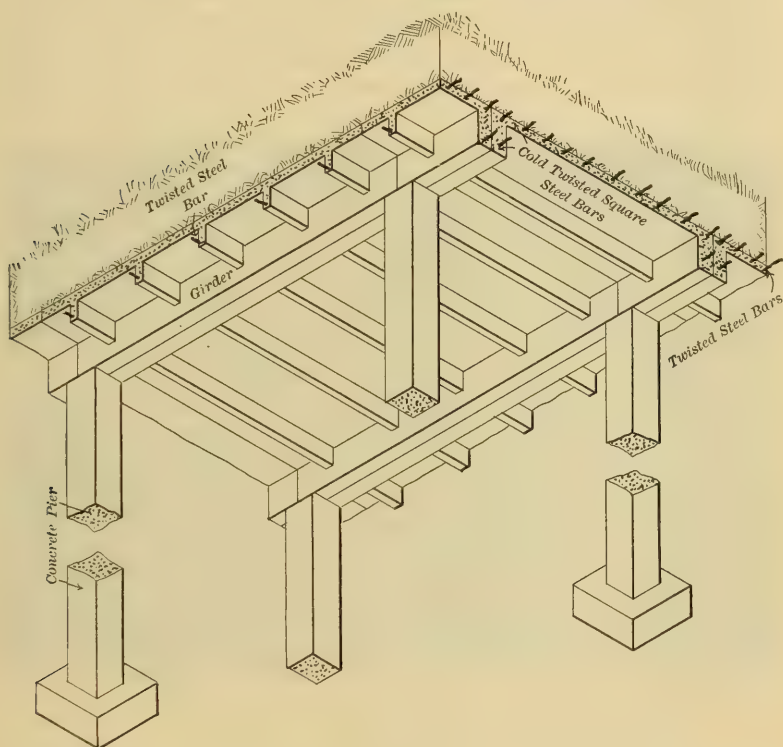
DESIGN FOR ROOF OF SEPTIC TANK. ISOMETRIC VIEW OF TYPICAL BAY.
